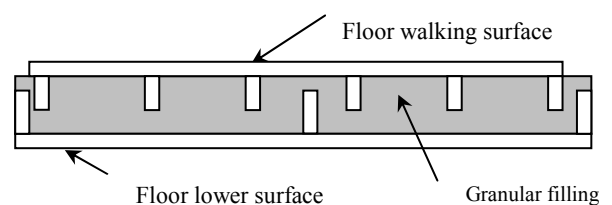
Swiss trial timber floor with upper floor surface floating on granular material (Walk and Keller, 2001).
